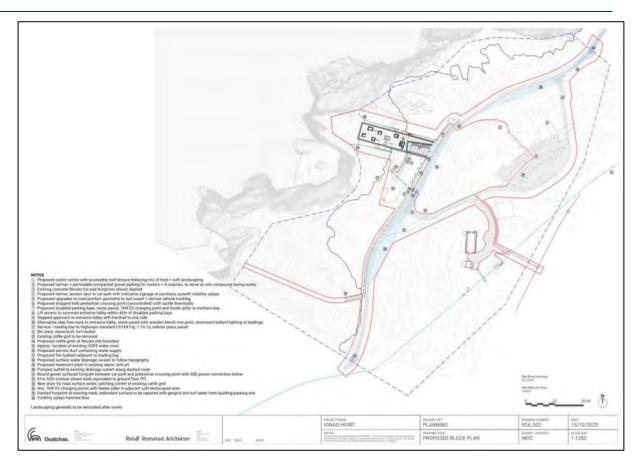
Ionad Hiort / St Kilda Visitor Centre Proposed Site Layout
